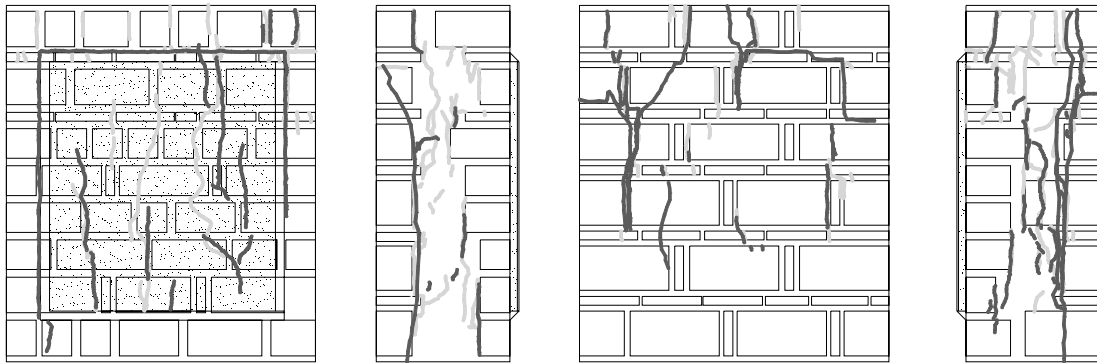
Crack pattern of Walette 3 before (light grey) and after grouting (dark grey)
